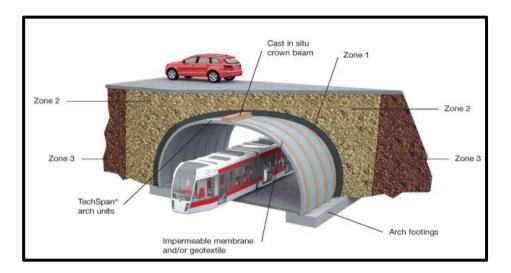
Zoning of Backfill for TechSpan Arch (Reinforced Earth Co. Ltd, Technical Information, 2014)
